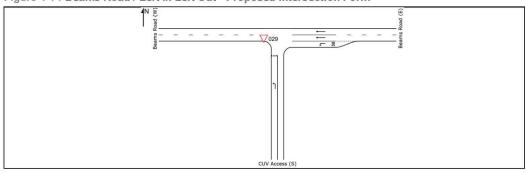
Beams Road / Left In Left Out - Proposed Intersection Form
